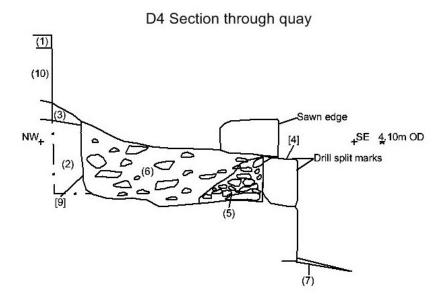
Section drawing through the Upper Quay wall in test-pit 2
